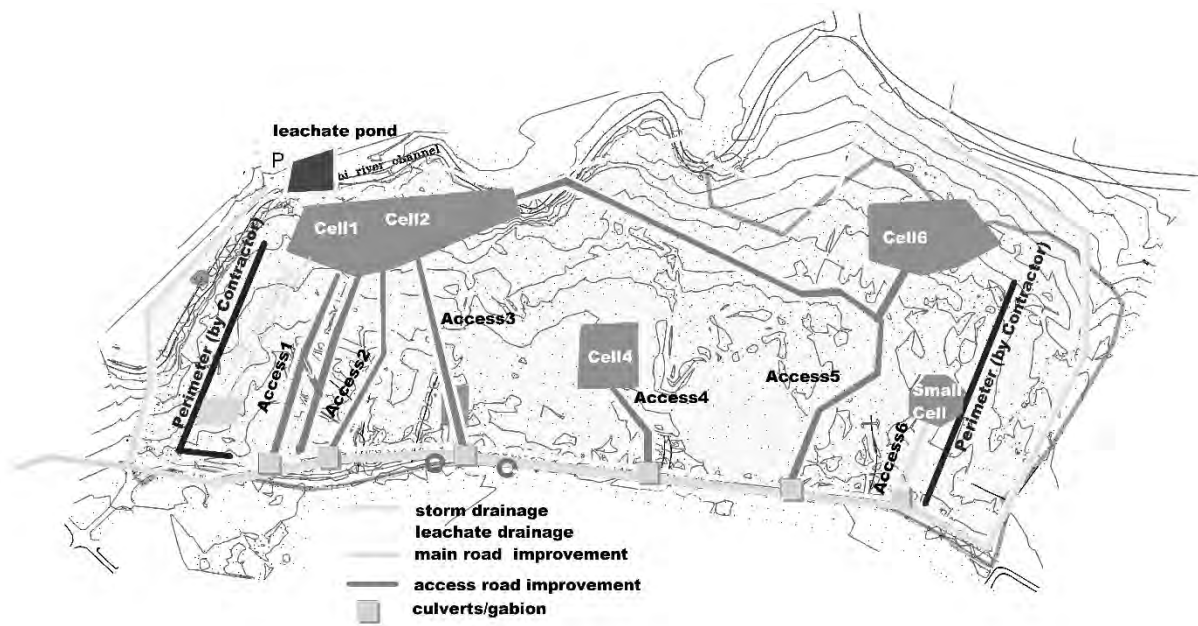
Layout Plan of Dandora Dumpsite in Phase 1
